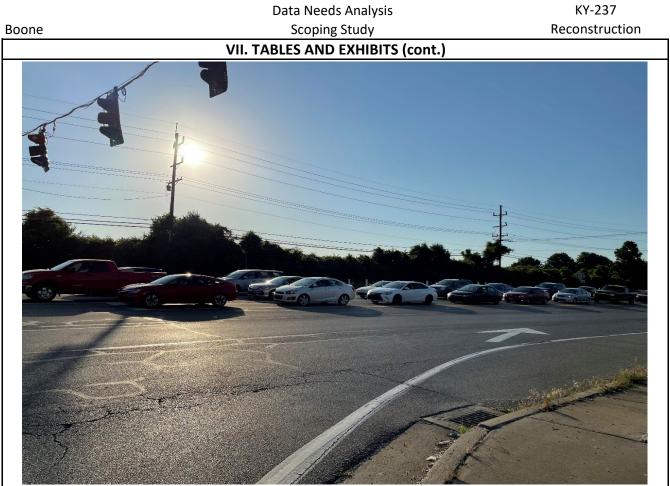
View from Litton Lane Facing East Toward KY 237
